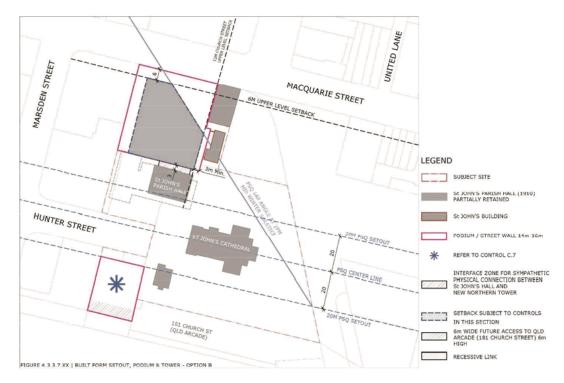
XX 6.10.19.10 Built Form setout plan for Option B
